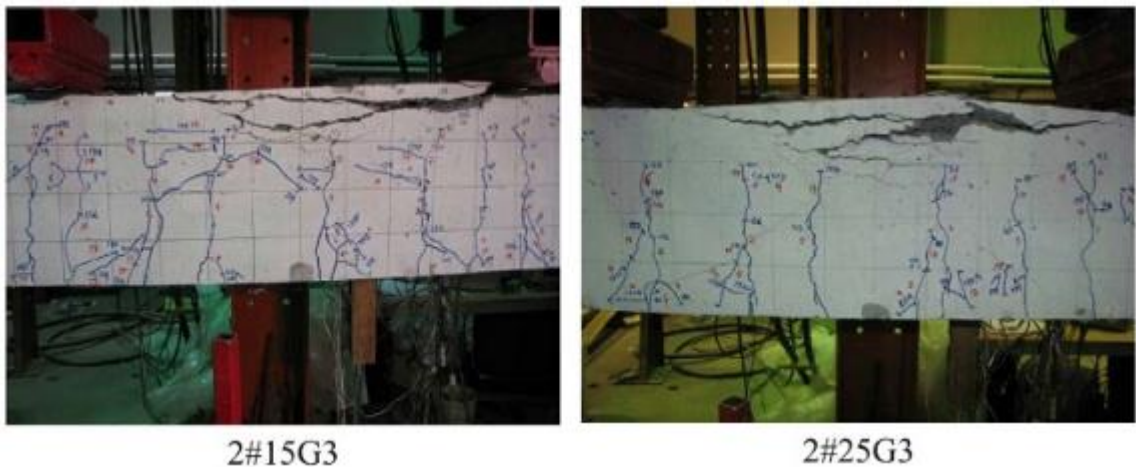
Compression failure of the tested specimen (El-Nemr et al. 2018)
